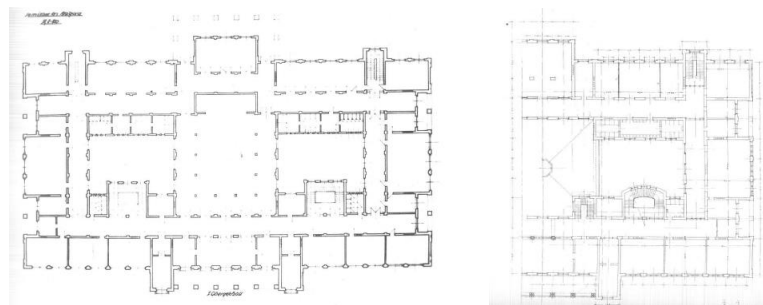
a) *Gazi Education Institute First Floor Plan*, b) *Gazi Education Institute Third Floor Plan (half of the floor plan)* [42]
